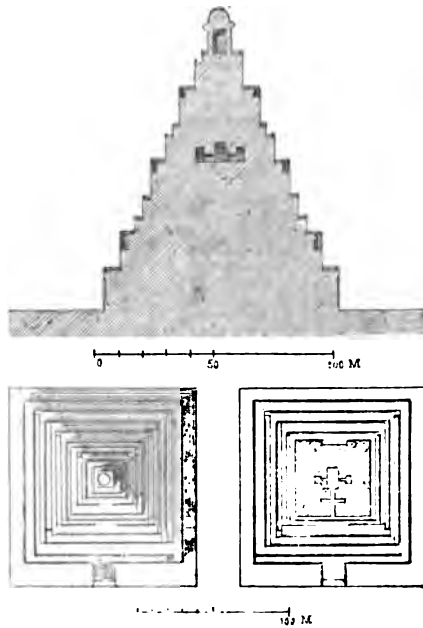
176.—Transverse section, plan, and horizontal section of a square, single-ramped, Chaldean Temple.
